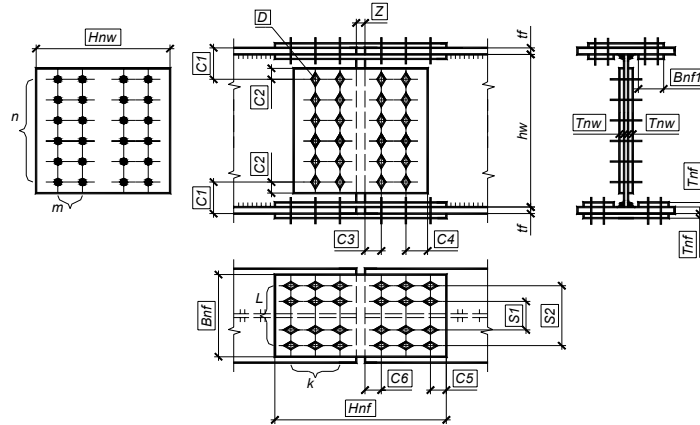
A structural design of the Beam-To-Beam joint where straps are used
